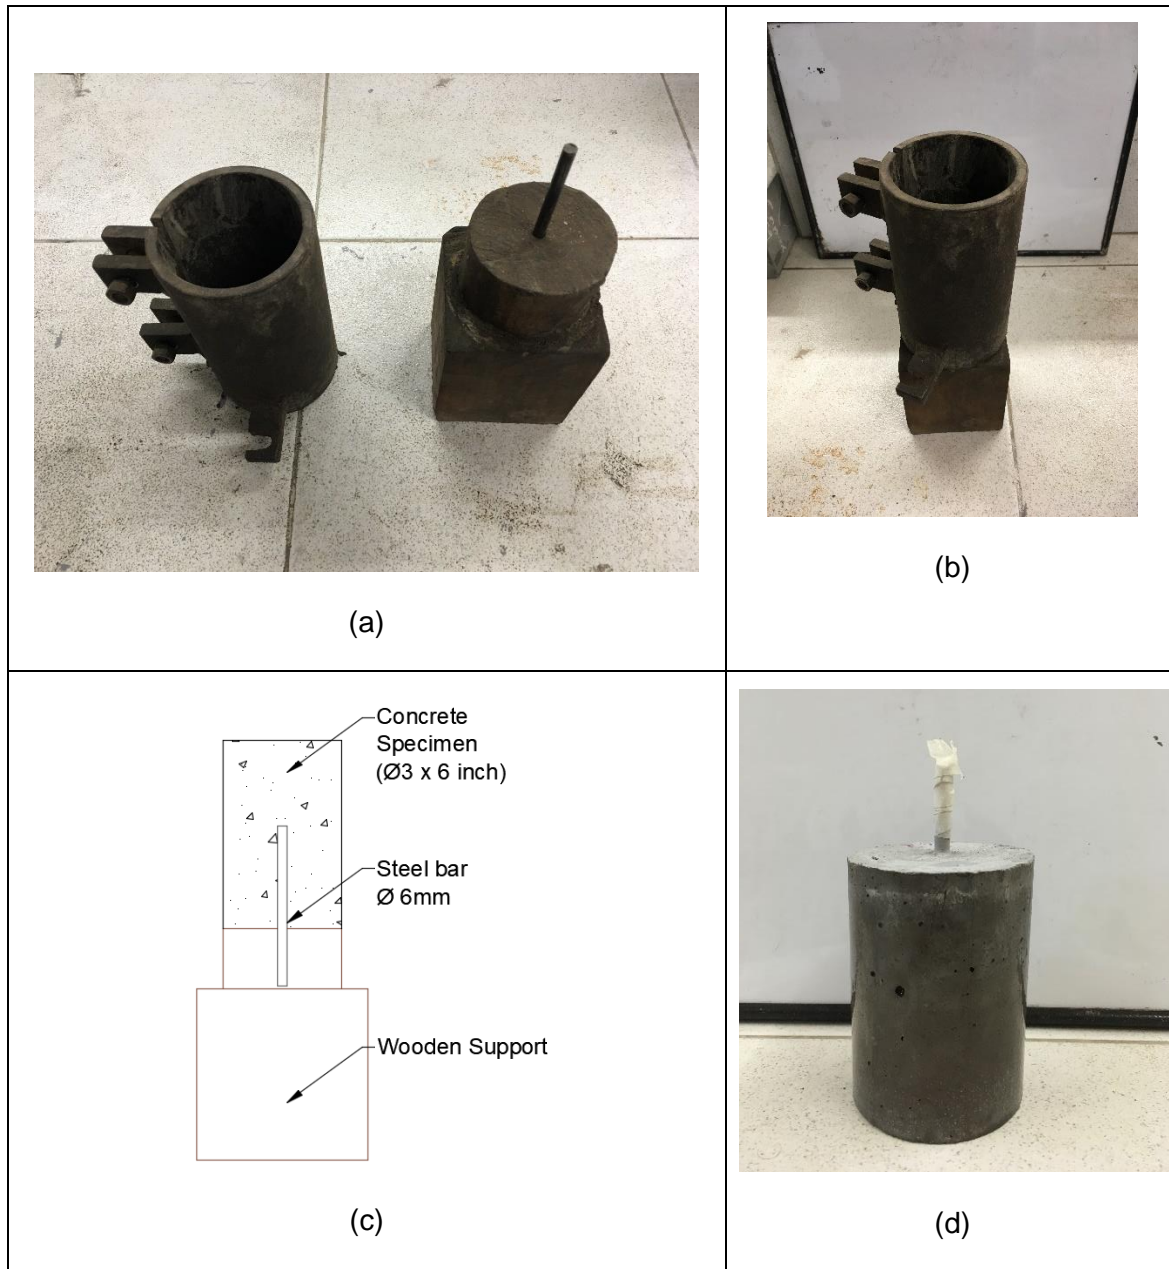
(a) Metallic mold (Φ 3" x 6") and wooden support with steel bar. (b) Assembled mold for concrete casting. (c) Specimen casting set-up (c) Resulting specimen after demolding.
